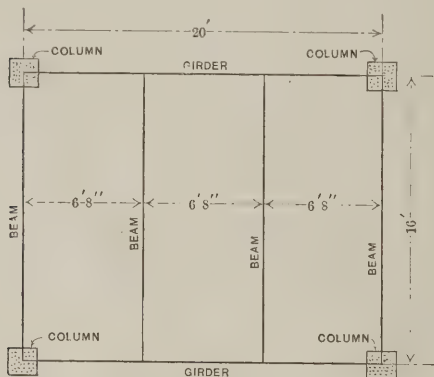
Showing How Beams and Girders Are to be Placed.
